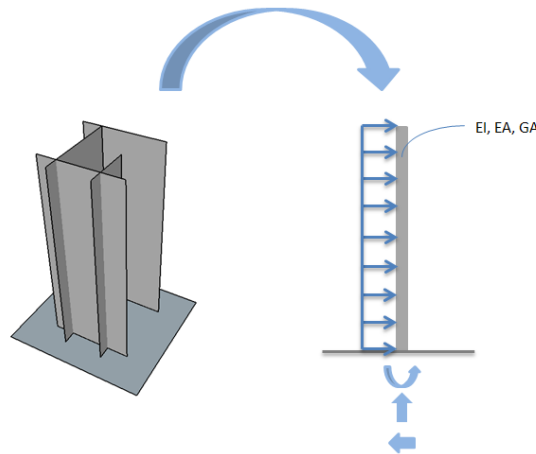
Schematisation of a stability structure into a cantilever beam
